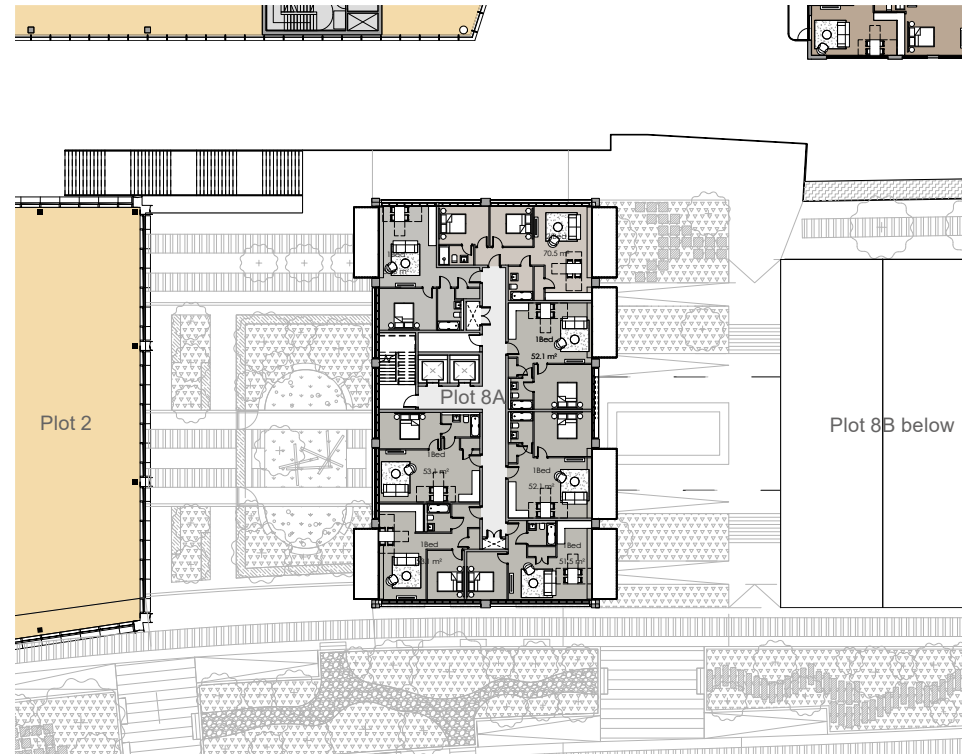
Plot 8A - Typical upper illustrative residential floor plan
